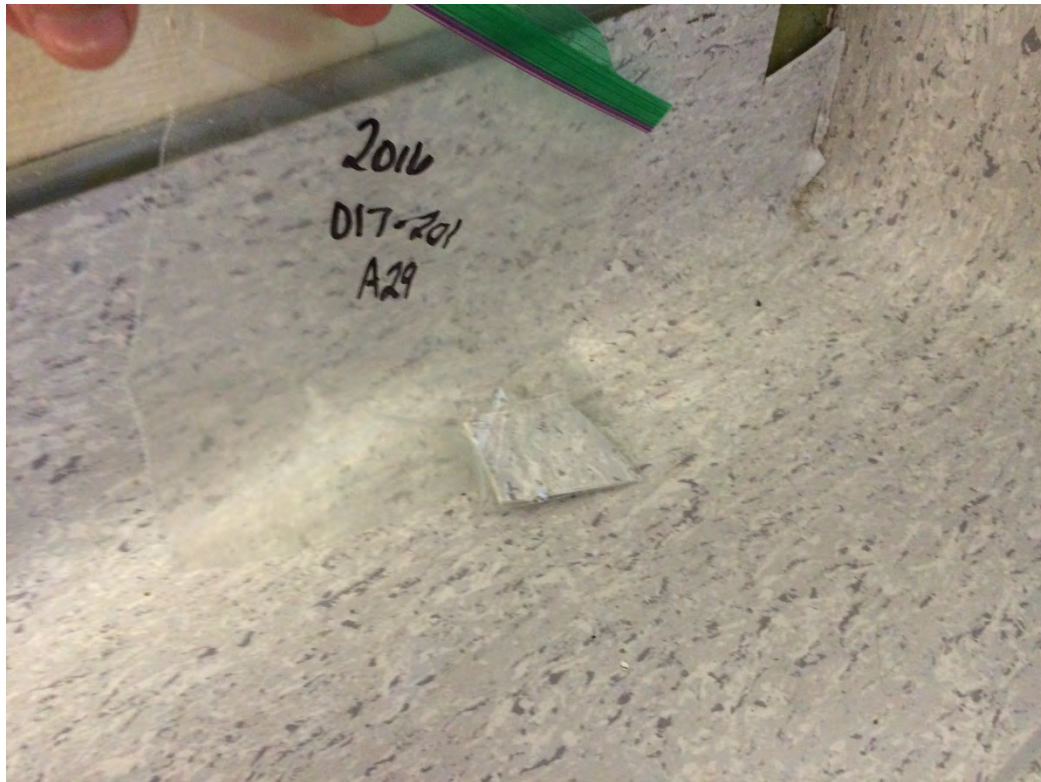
Asbestos sample A29, light grey seamless vinyl flooring with dark specks and adhesive collected from O17-201. No asbestos detected in flooring or adhesive.
